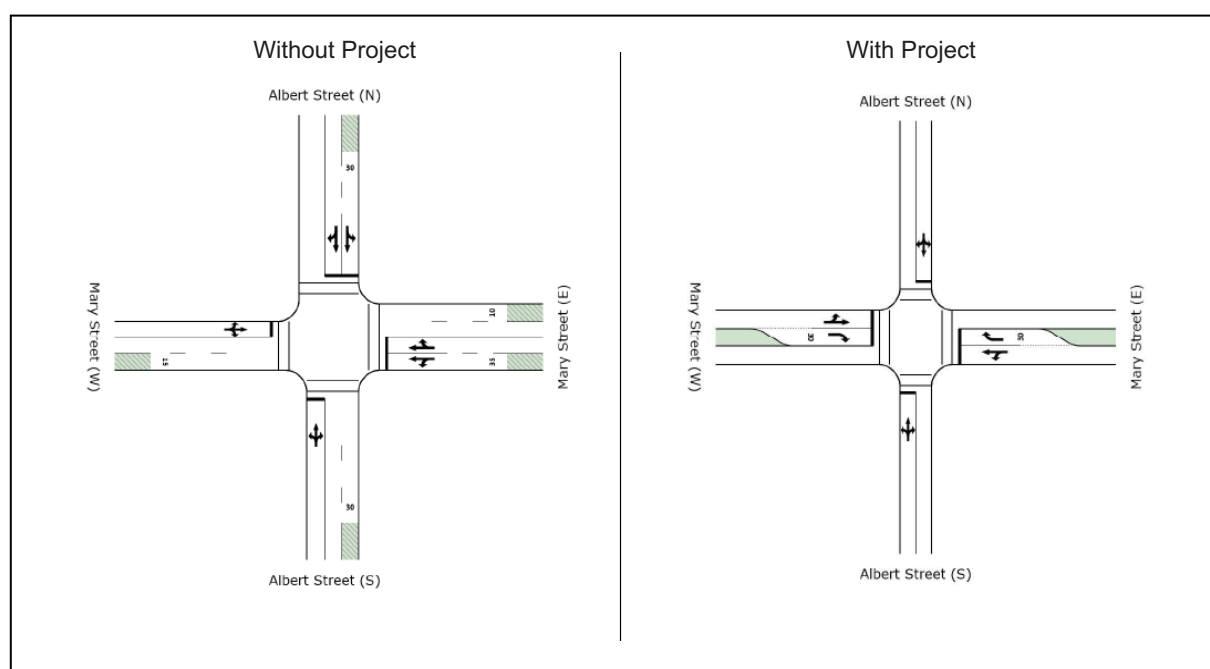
Proposed changes to intersection geometry at Albert Street/ Mary Street intersection
